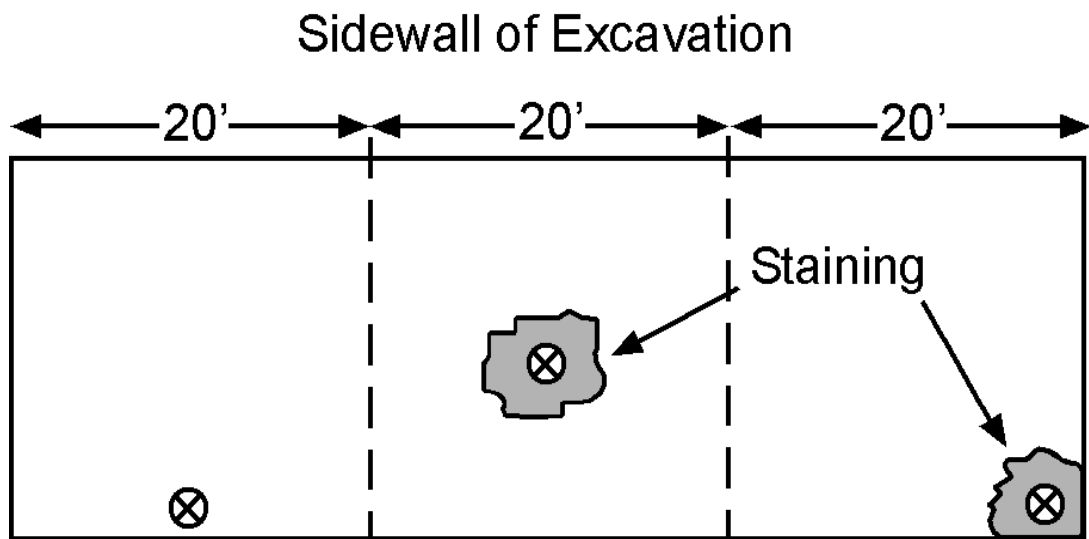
(a). Sidewall Soil Sampling After Excavation of Contamination
